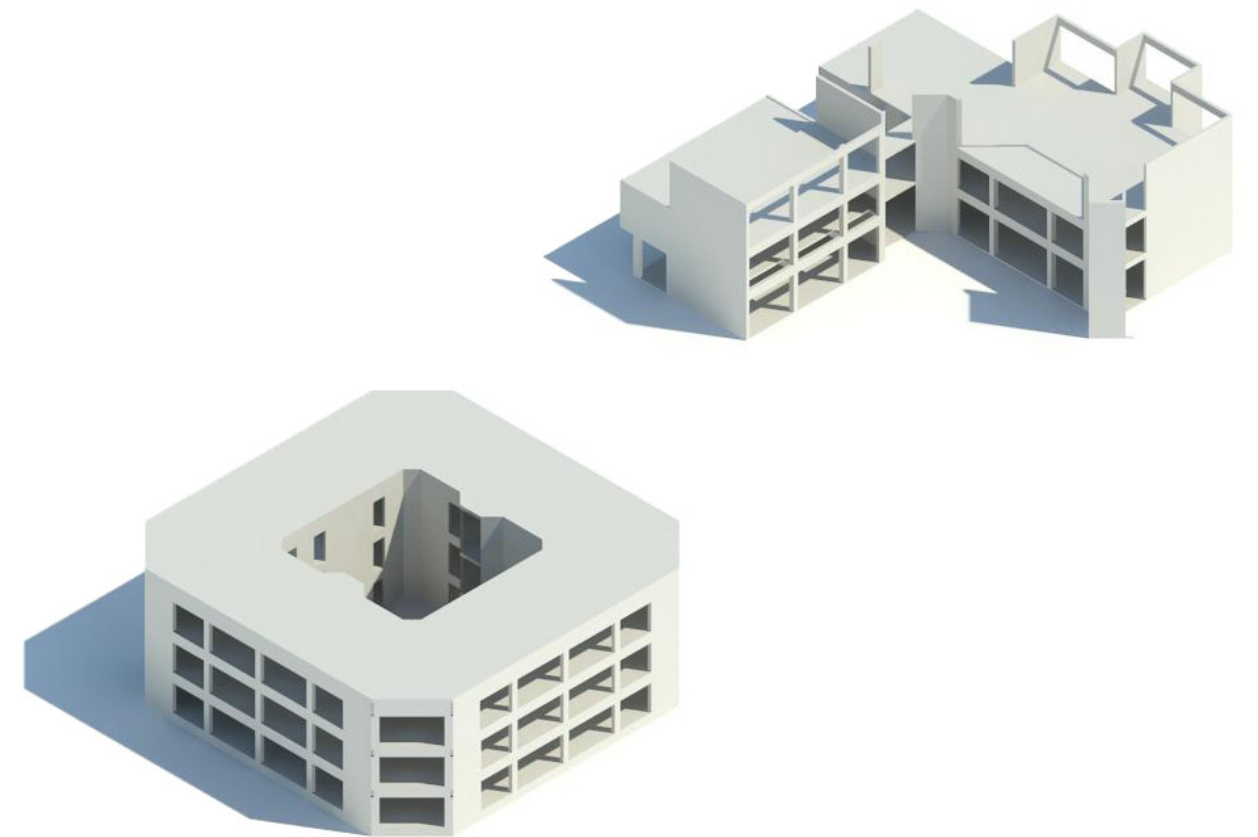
The existing building is stripped to the concrete frame, which leaves only these elements
